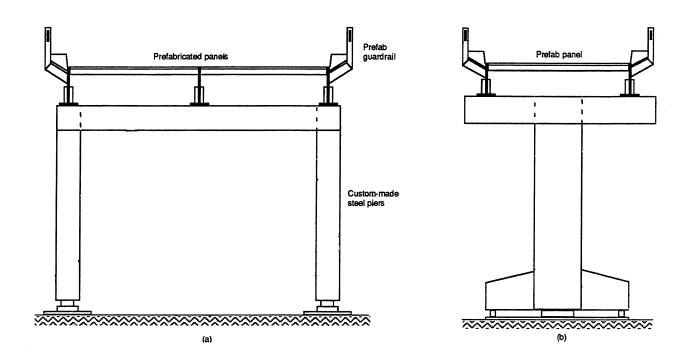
Rheinhaussen Fast Assembly Bridge
